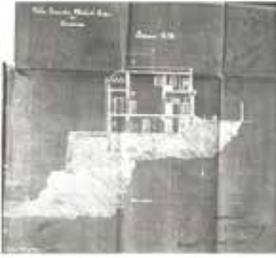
Annex Plan to Building Permit no.684 in August 1898. Photocopy of the National
